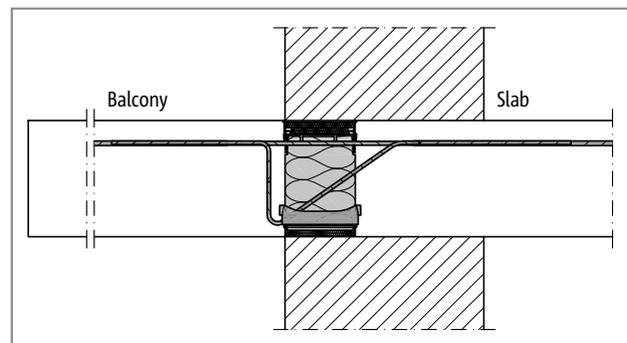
Schöck Isokorb® XT type K: Connection with single-leaf masonry
